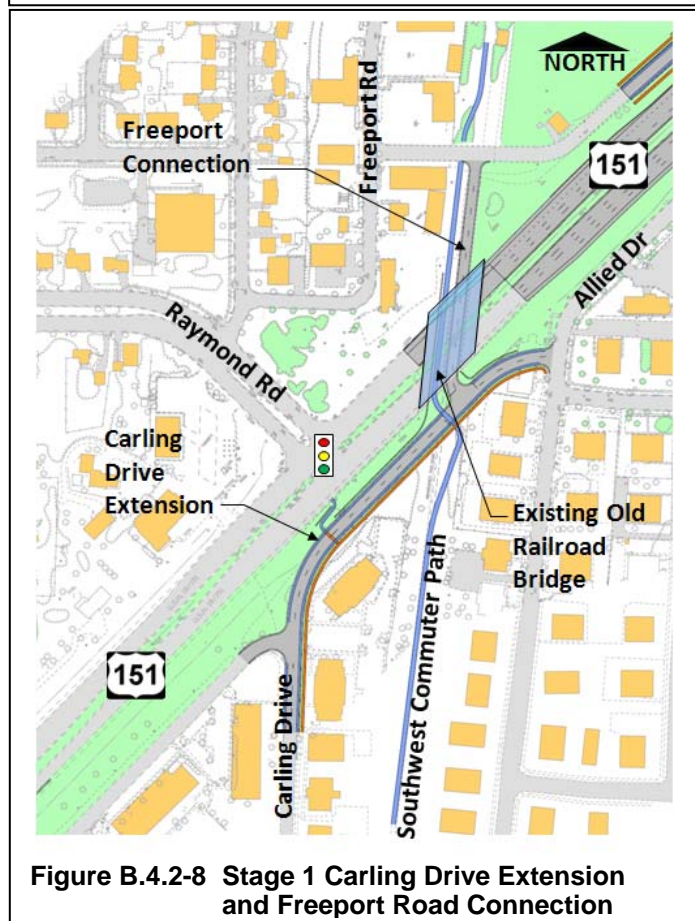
Stage 1 Carling Drive Extension and Freeport Road Connection
